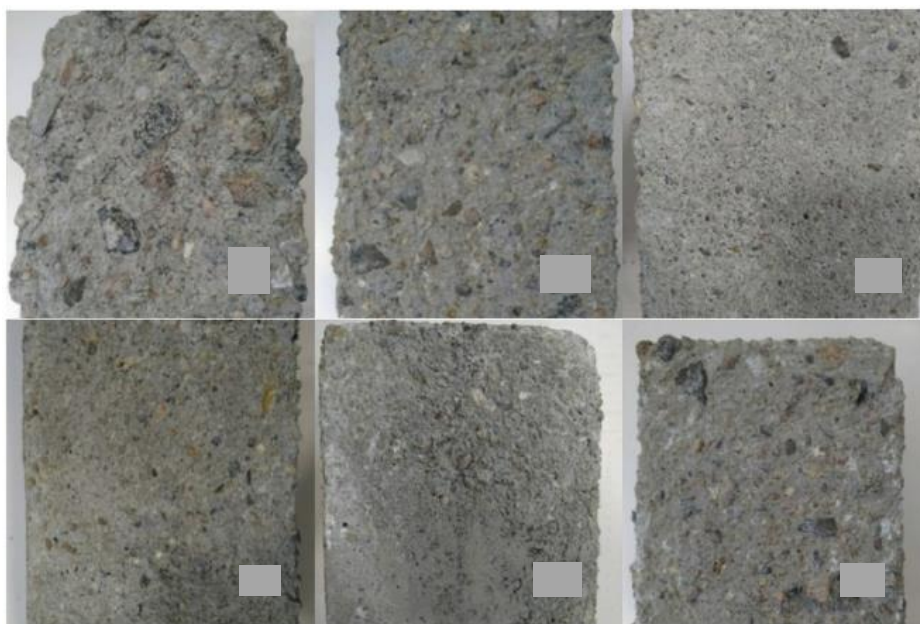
Concrete surface after freezing-thawing cycles (spalling of the concrete surface) [9].
